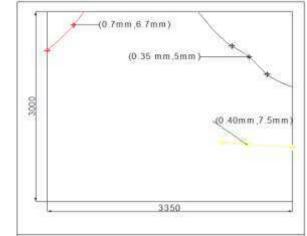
Crack Profile Drawing hall wall 2 & 4
